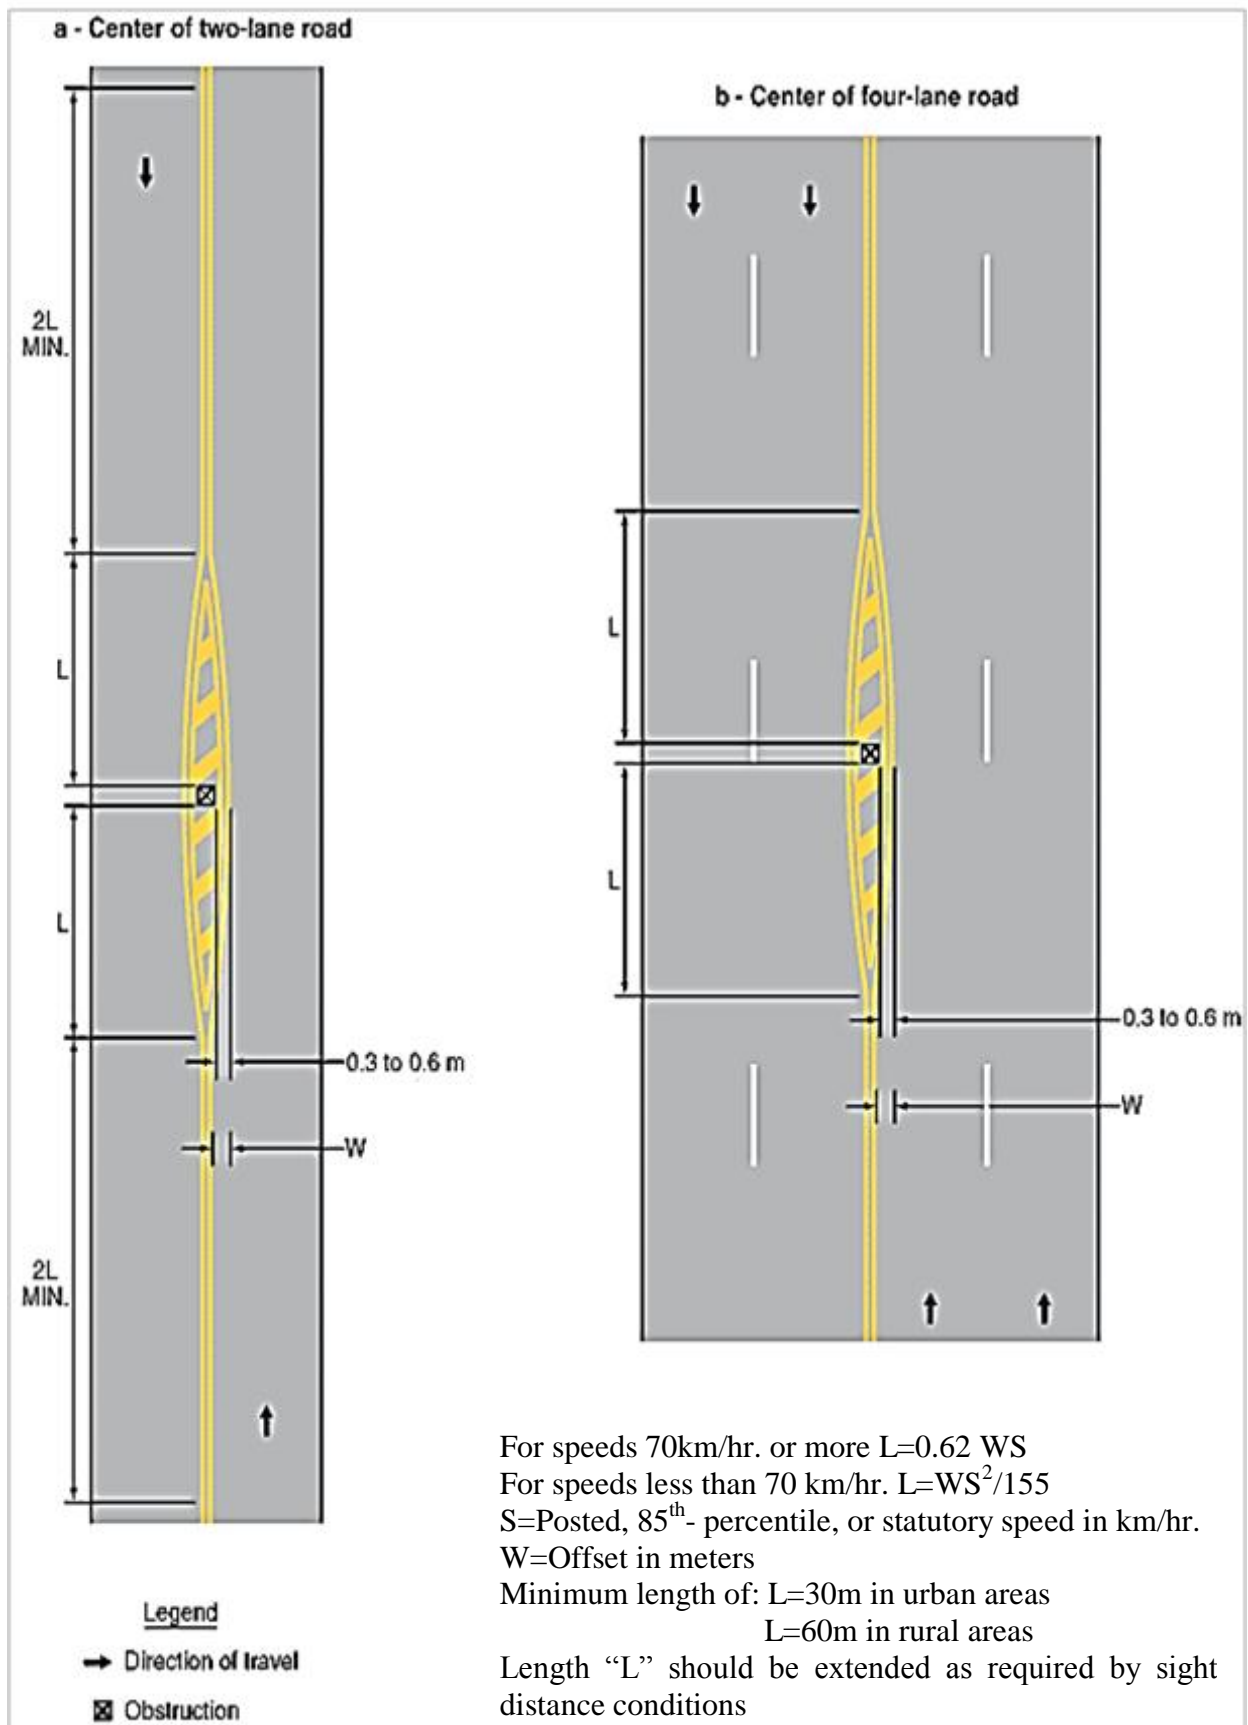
/21: Examples of Markings for Obstructions in the Roadway [2, p.3B-21]
